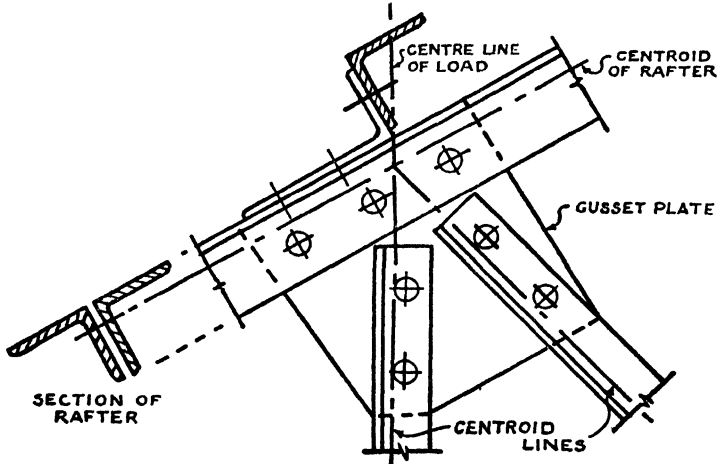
CONNECTION FOR ROOF TRUSS MEMBERS
